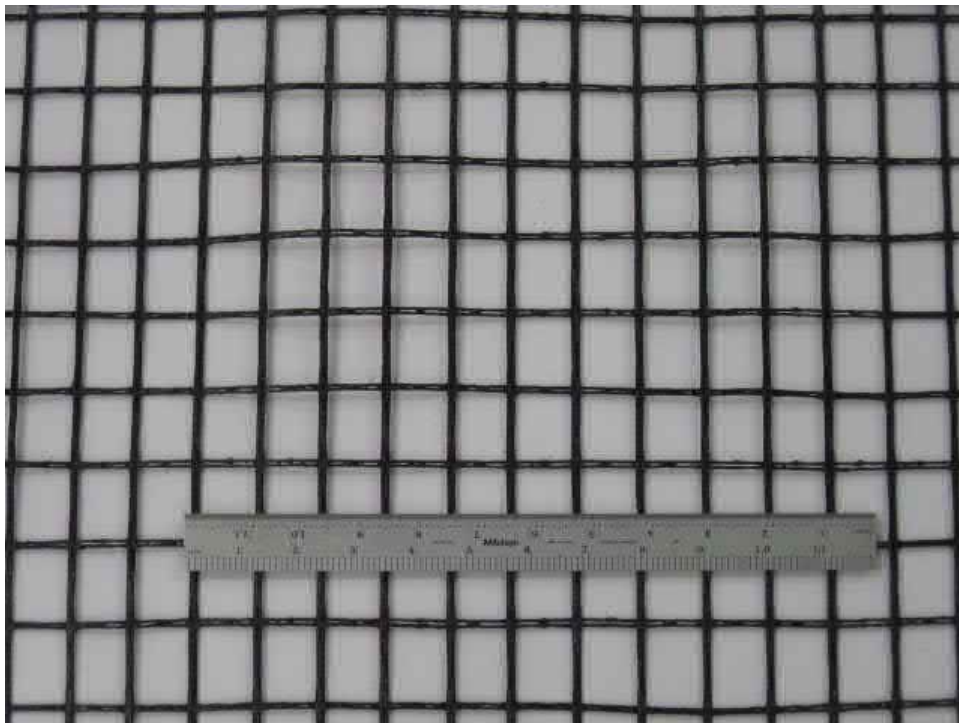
Photo of Miragrid 3XT (machine direction is perpendicular to ruler shown).
